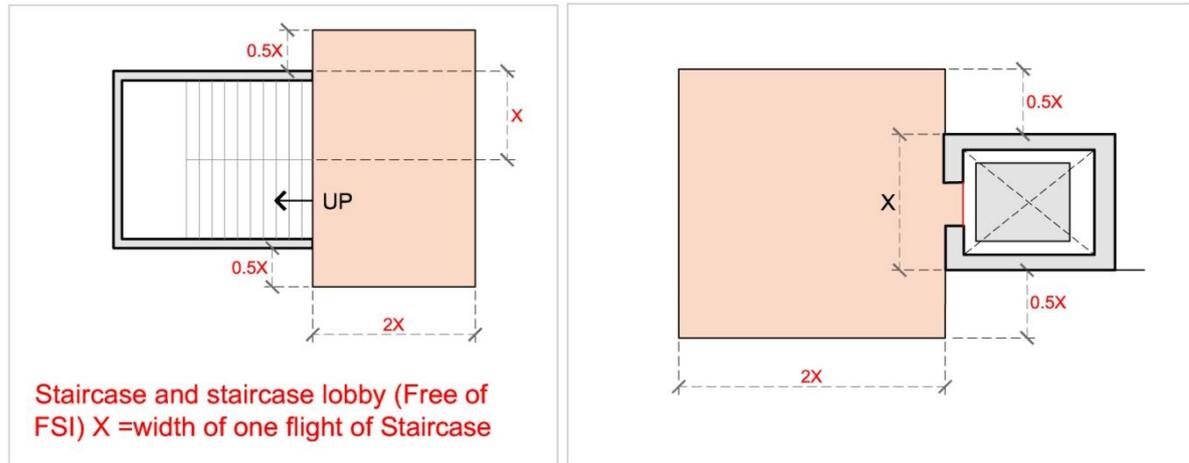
Staircase, Sky Walks and Stair Cabin / Mumty
